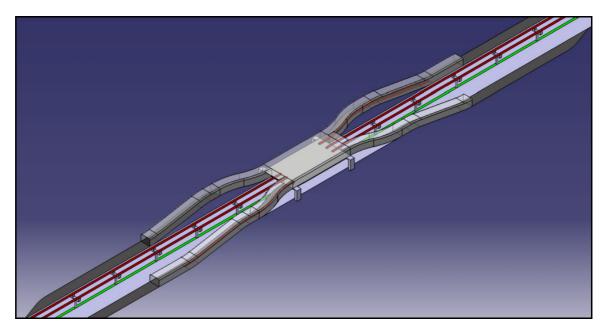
Isometric View On/off Switch over Existing Road
